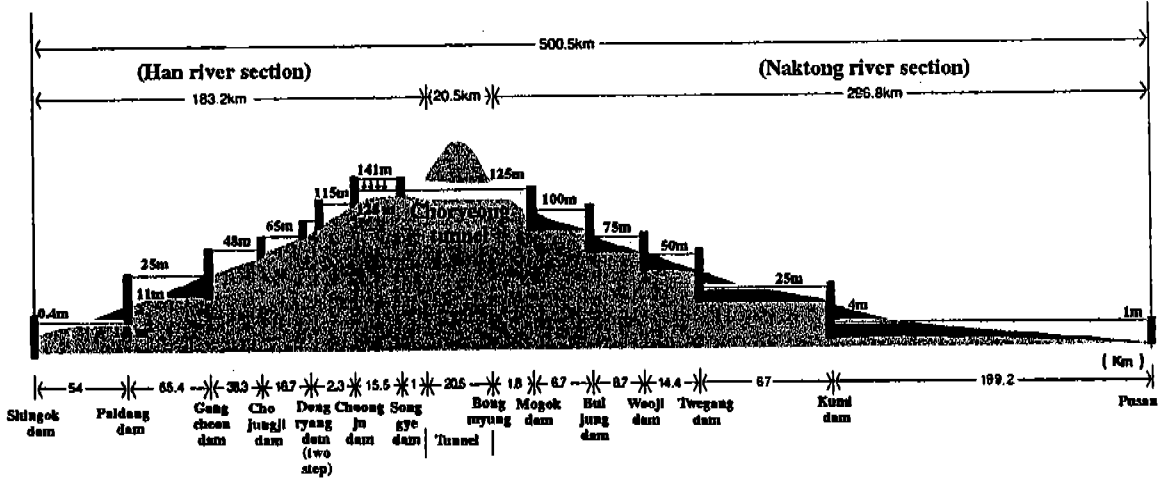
Elevation plan of the Kyungbu canal. The dam (locks) in the Naktong river section are tentative one. The lake above the Chungju dam is changeable in the water level from 141 m to 125 m. The dark areas below the Paldang and Gangcheon dam represent the deep excavation.
